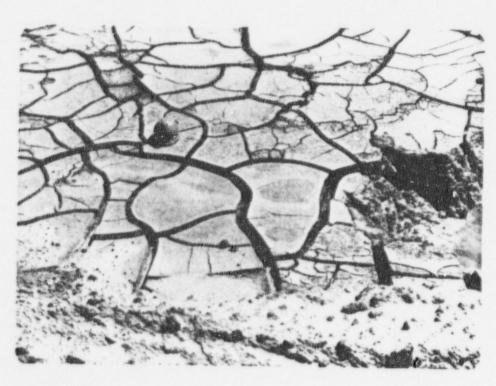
VIEW FROM EMBANKMENT SHOWING SLIMES DEPOSITED NEAR EMBANGMENT CREST.
